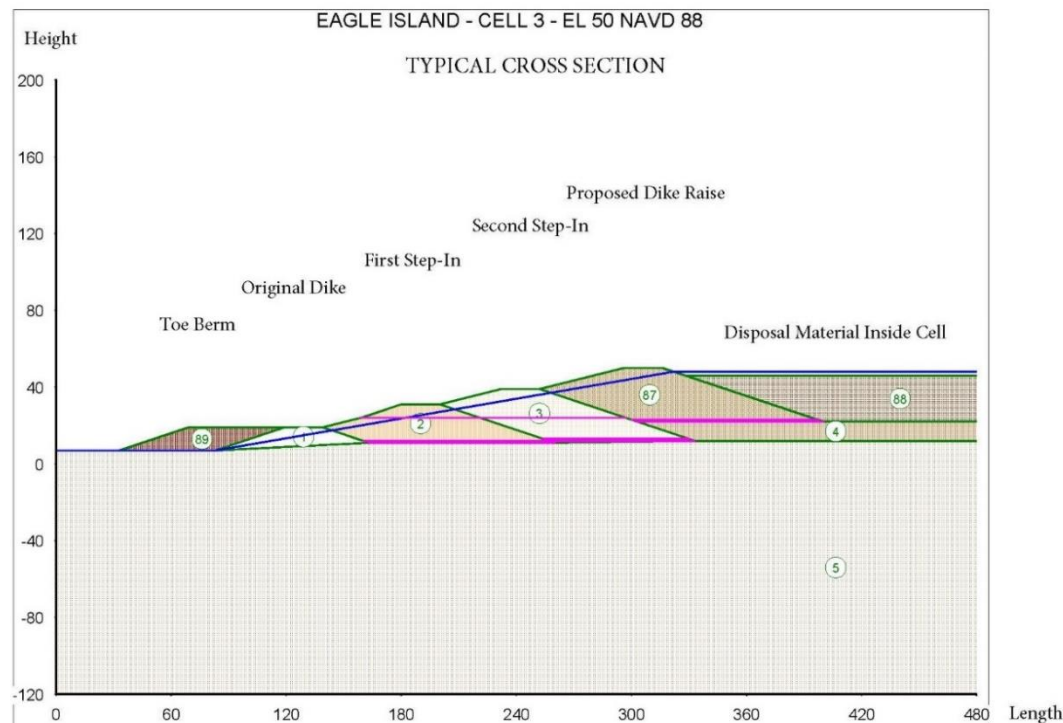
Typical Cross Section of Proposed Dike Raise and Toe Berm
